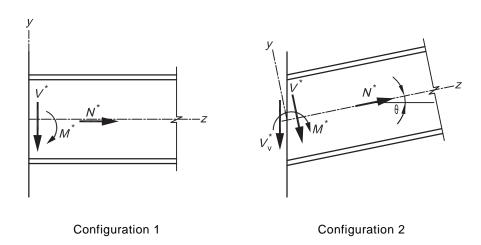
DESIGN ACTIONS ON BEAM AT COLUMN
